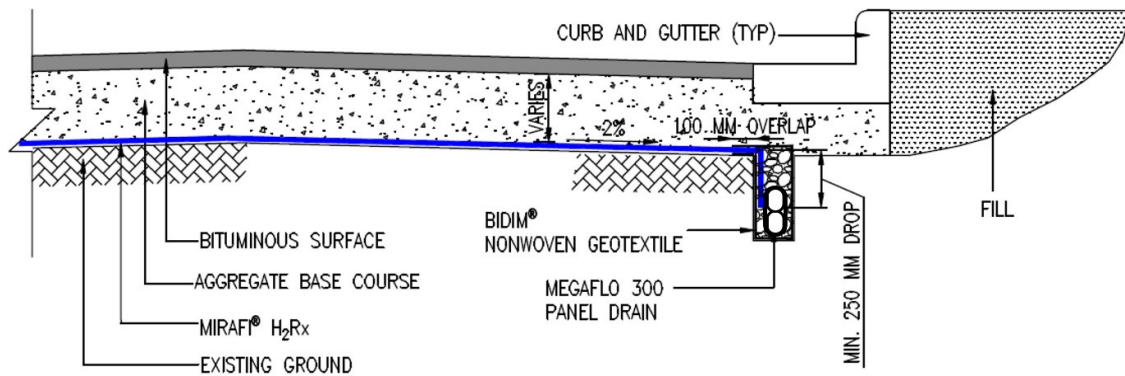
(a): A typical cross section diagram for geotextile edge terminated in a Megaflo® panel drain (with outlets).
